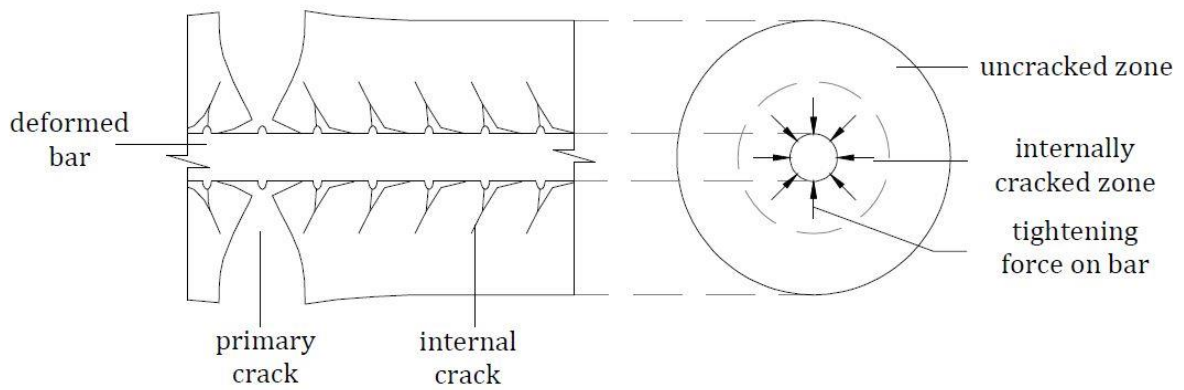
Internal cracking around the ribs of reinforcement in reinforced concrete section, Goto (1971).
